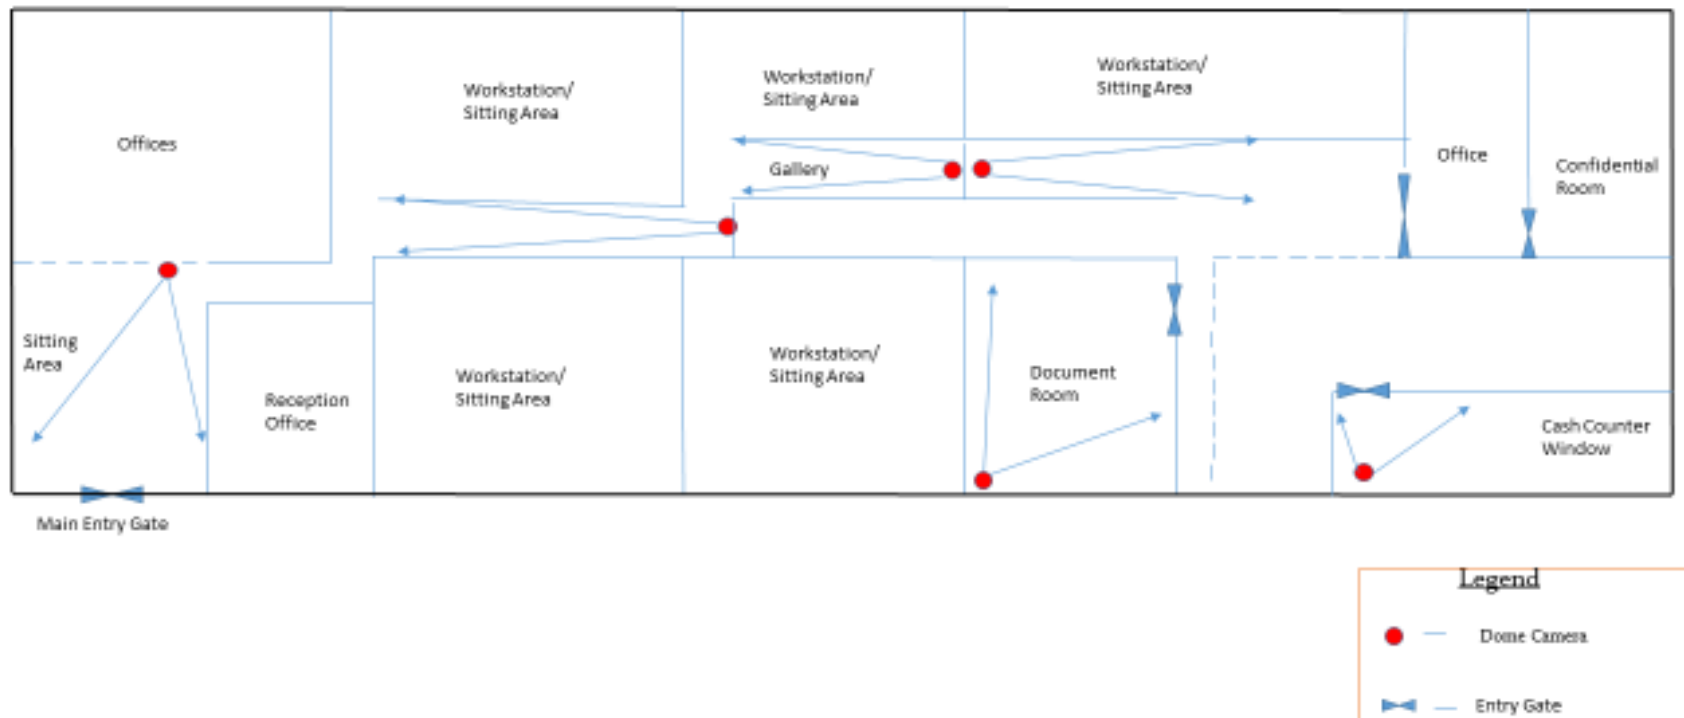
CCTV Layout Plan (MD Office & Finance)
